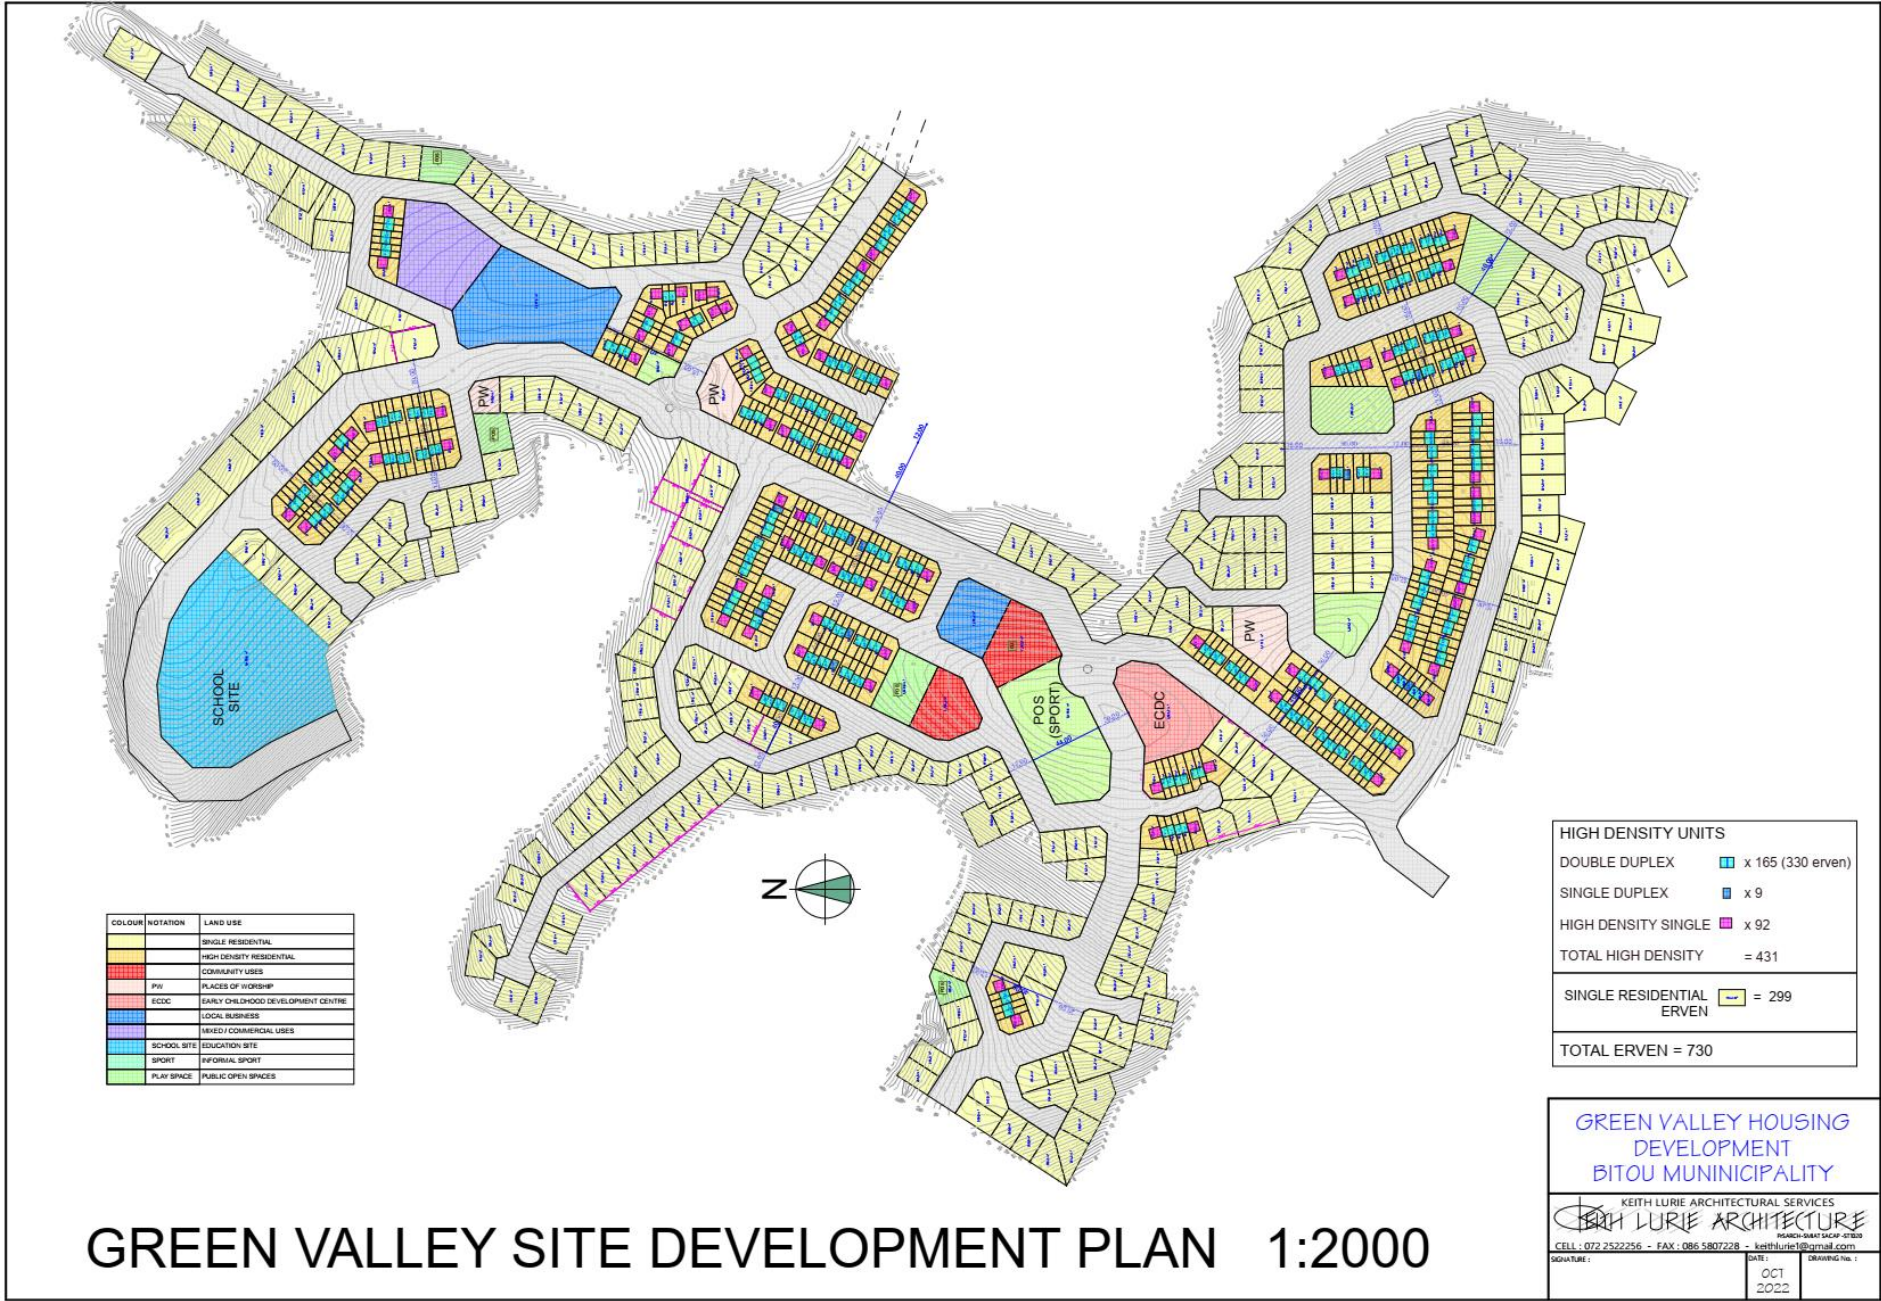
Conceptual Site Layout Plan for Proposed Mixed Use Development.
